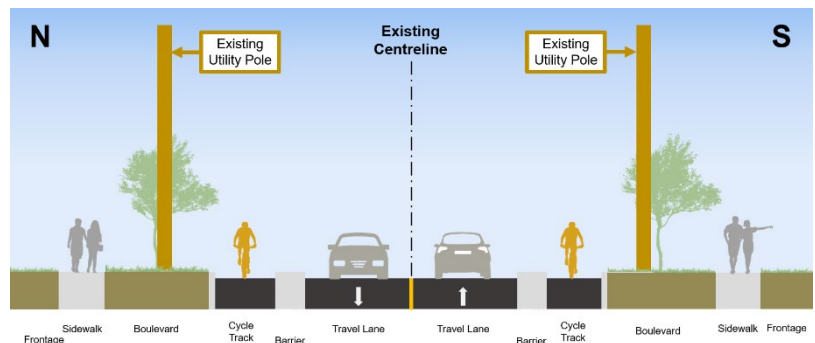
Illustration showing proposed lane, multi-use trail and sidewalk changes on Ellesmere Road between Meadowvale Road and Kingston Road, facing west.
